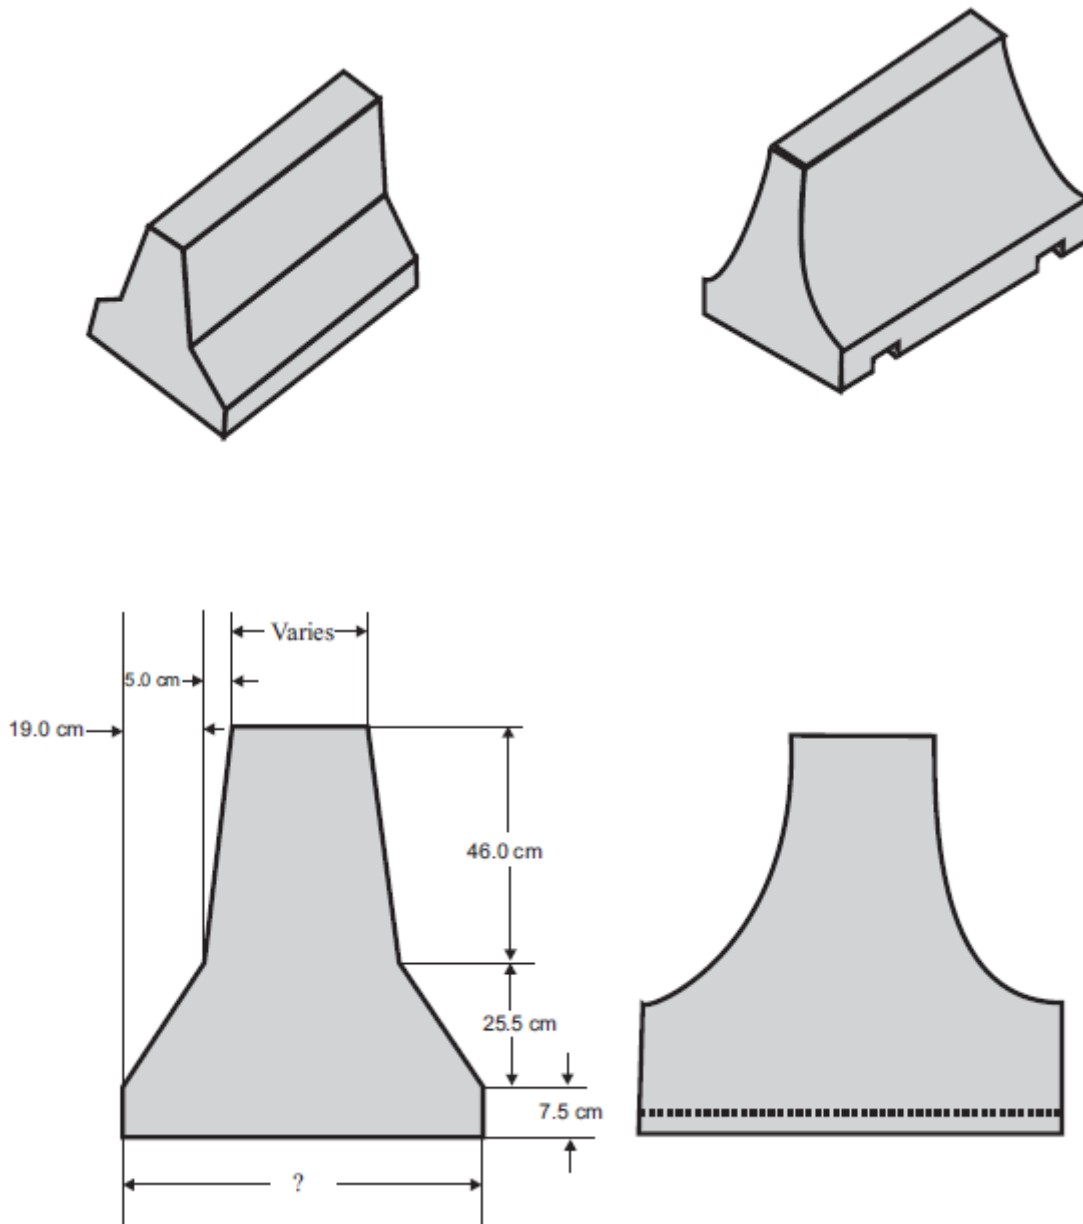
PRE-CAST CONCRETE BARRIERS
